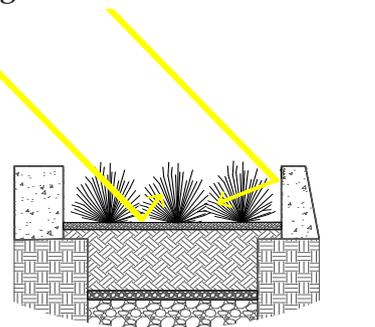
Reflected heat reflects off concrete planter sides and pea gravel
